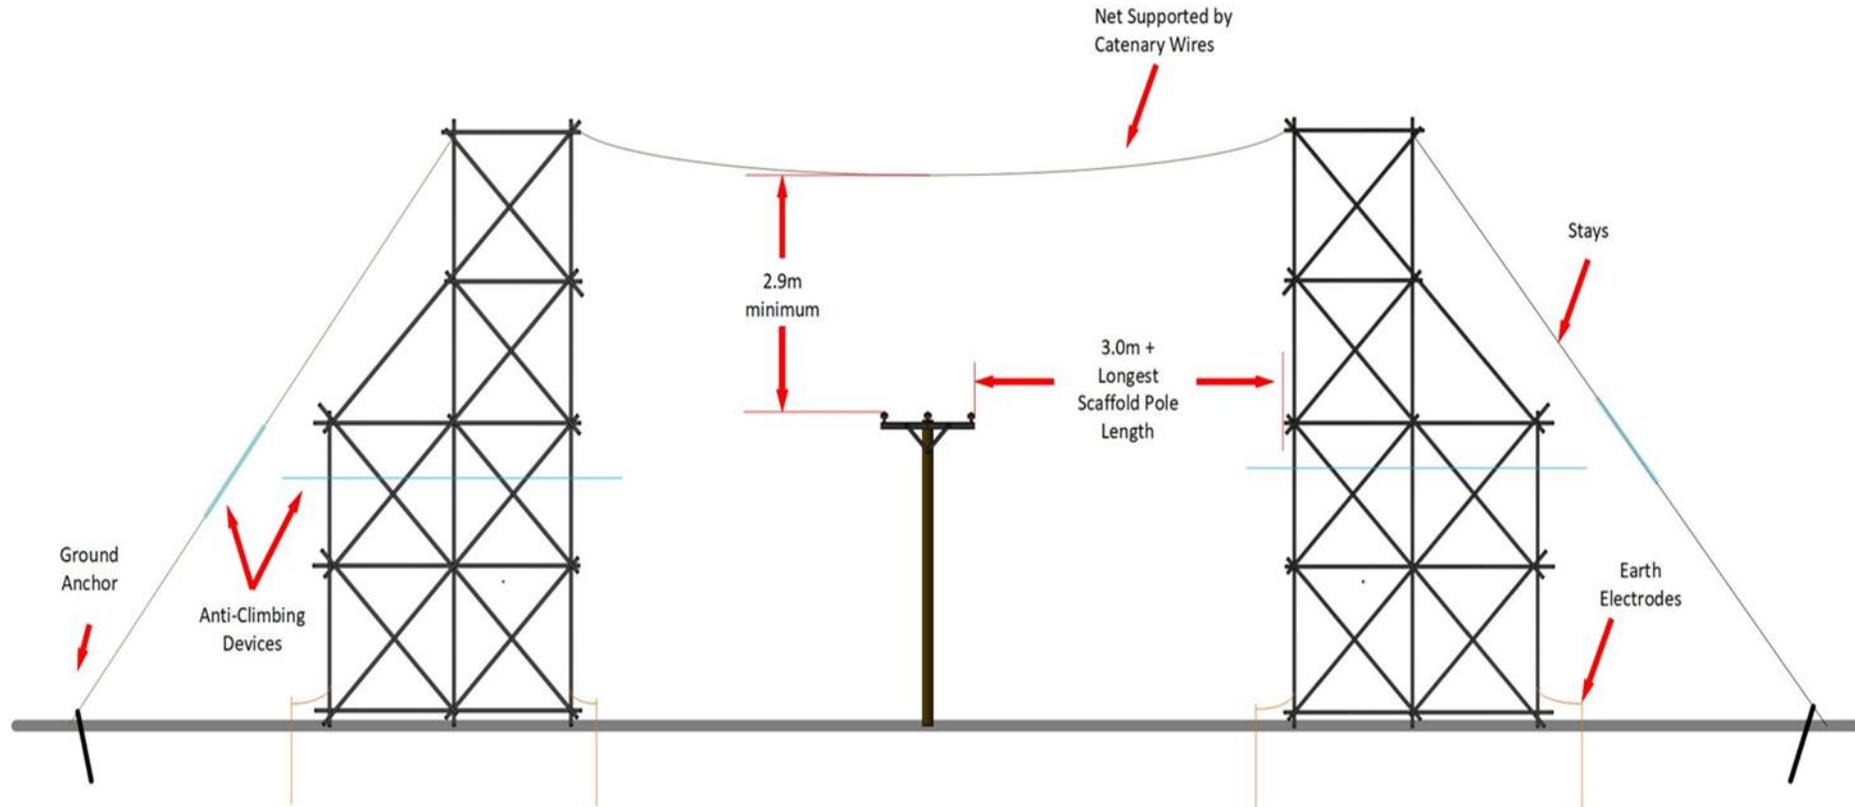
Elevation of Scaffold and Netting over 11kV Crossing
